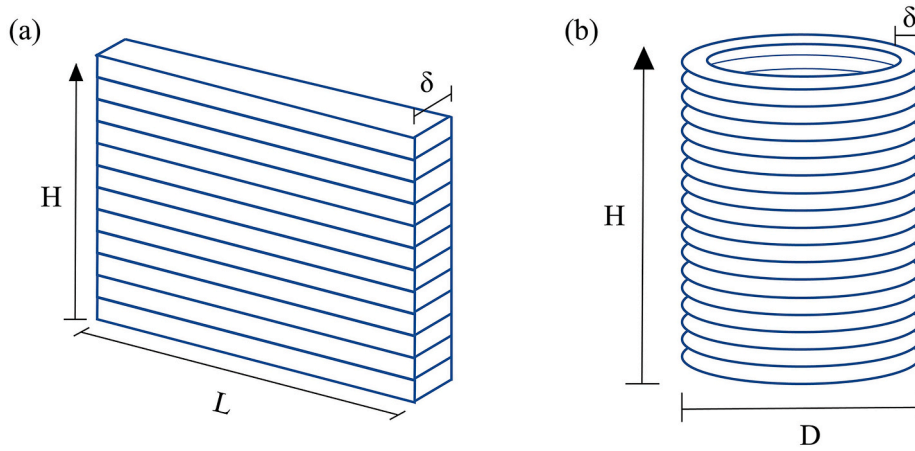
Schematic configuration of printed (a) straight wall and (b) hollow cylinder.
